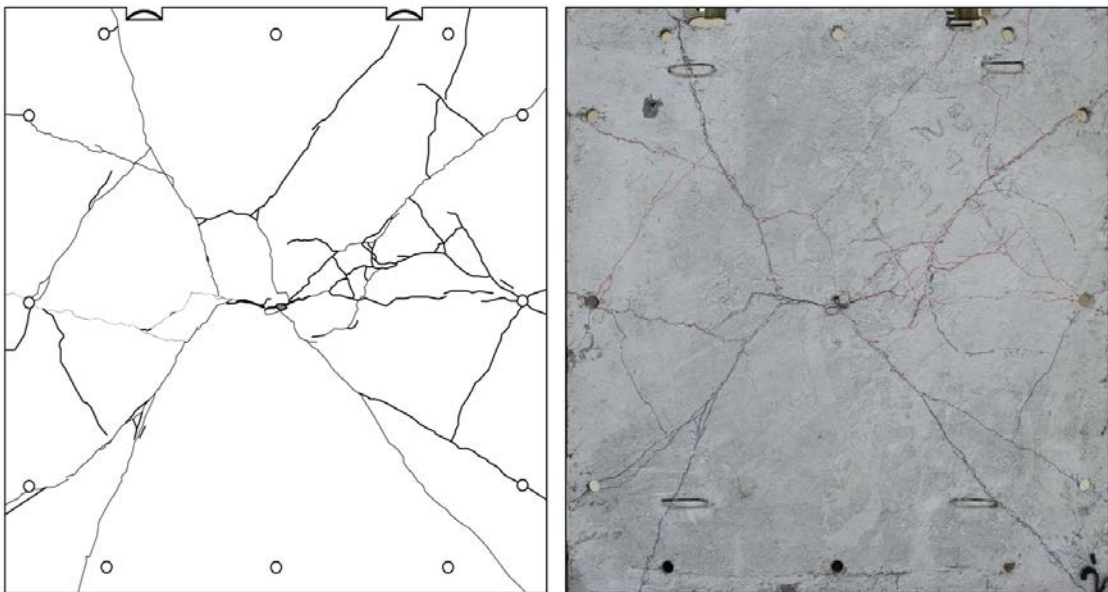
Front Face Crack Patterns After Testing for Panel JA2-075+PVA
